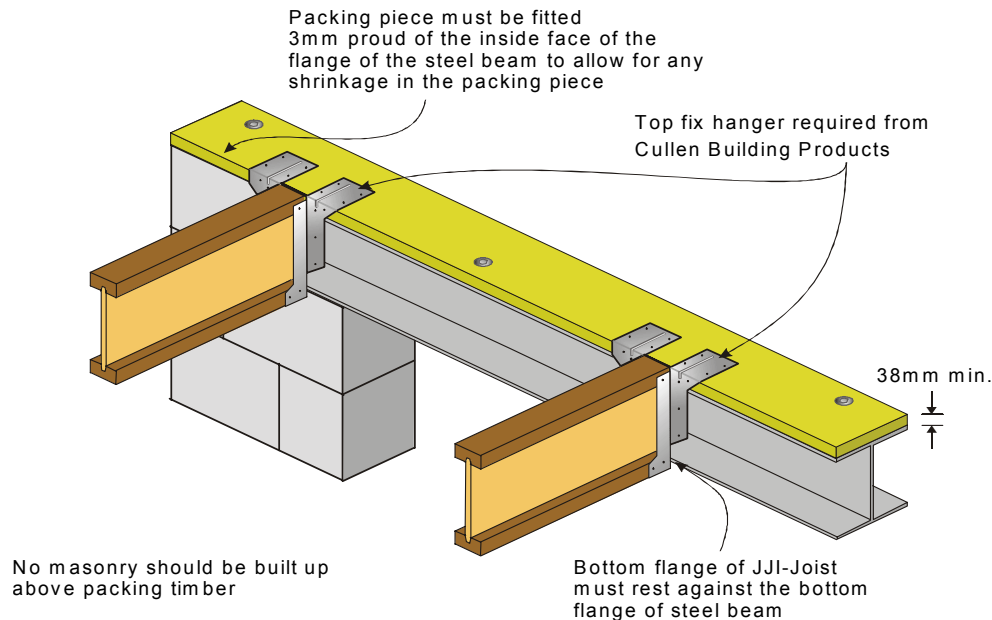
JJI-Joist to steel I-Beam connection with timber packing piece
